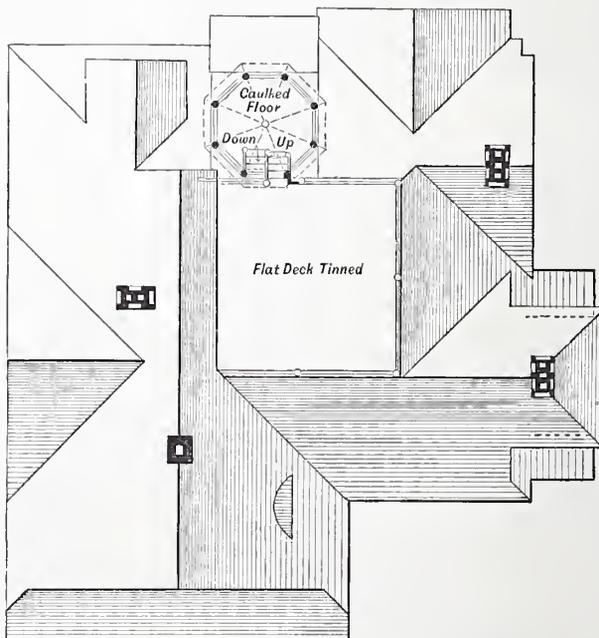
Roof Plan.—Scale, 1-16 Inch to the Foot.
